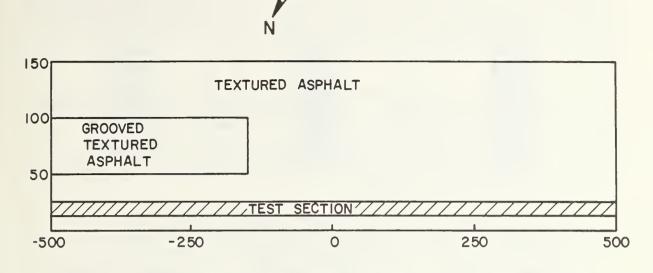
Plan of asphalt test area on runway 4-22. Distances are in feet.
